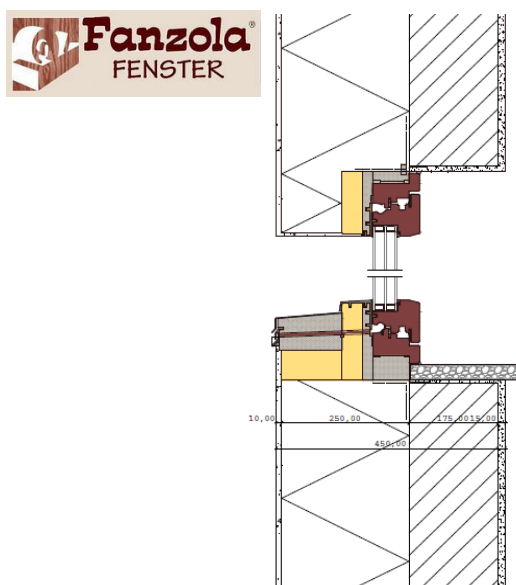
Null Fenster installation detail (Source: www.fanzola.it and www.passiv.de)
